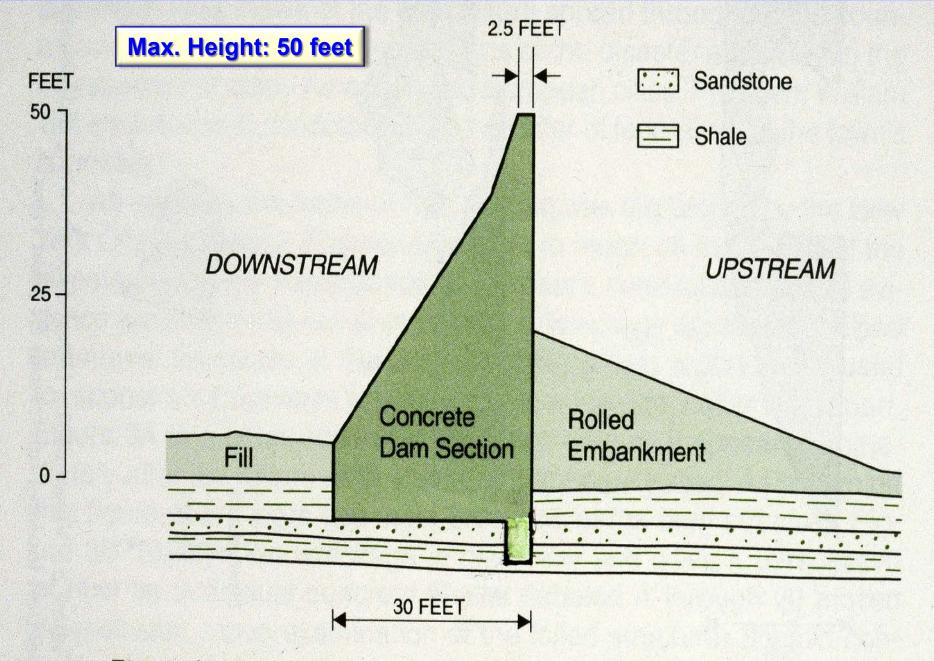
Prefailure cross section of Austin Dam at Block "D."
